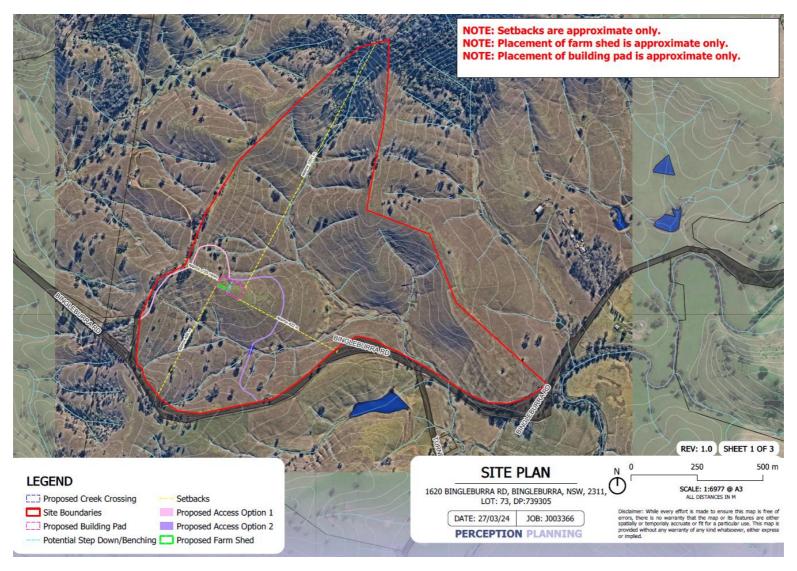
Site Plan - Sheet 1 (Perception Planning 2024)
